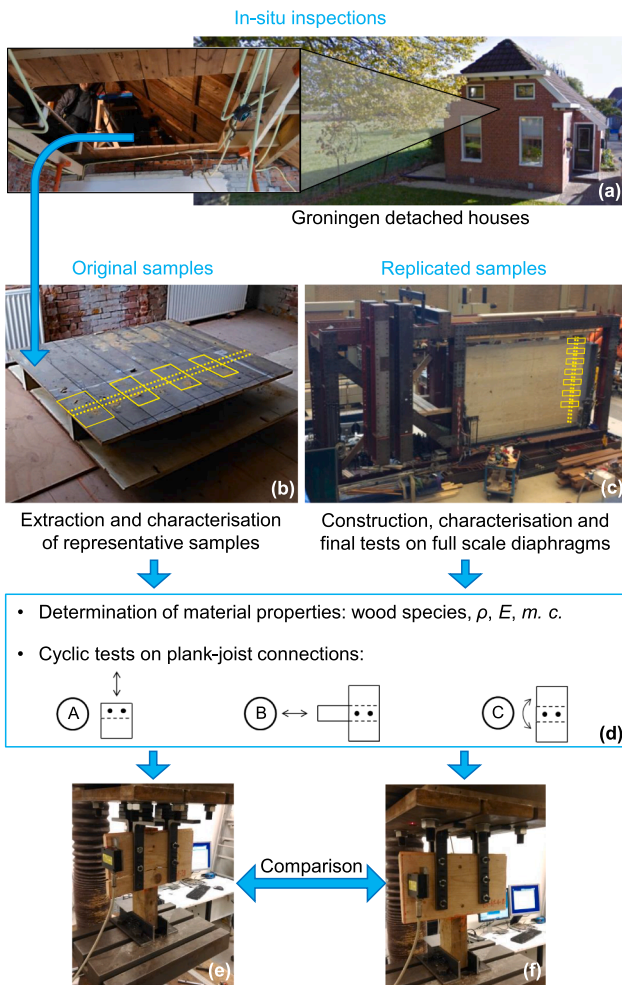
Process followed for the determination of material properties of timber and plank-joint connections for original and replicated samples: (a) in-situ investigation and selection of samples; (b) extraction of floor and roof samples; (c) construction of replicated specimens on the basis of the characteristics of original ones; (d) characterization of material properties and cyclic behaviour of plank-joint connections, with comparison between extracted (e) and replicated samples (f).
